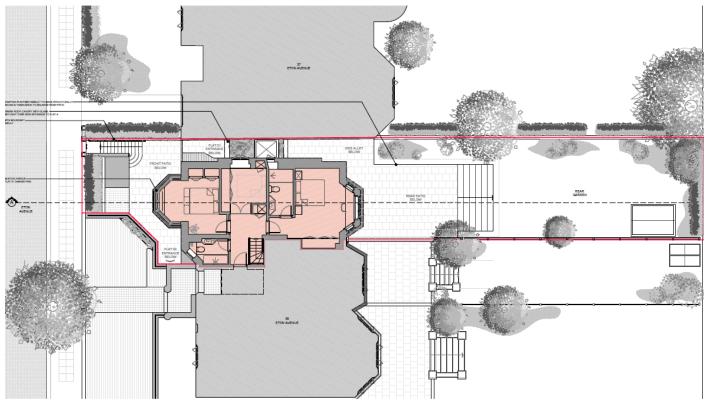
Proposed Site Plan red-lining Flat 1, 39 Eton Avenue where works are proposed. No works are proposed elsewhere onsite.
